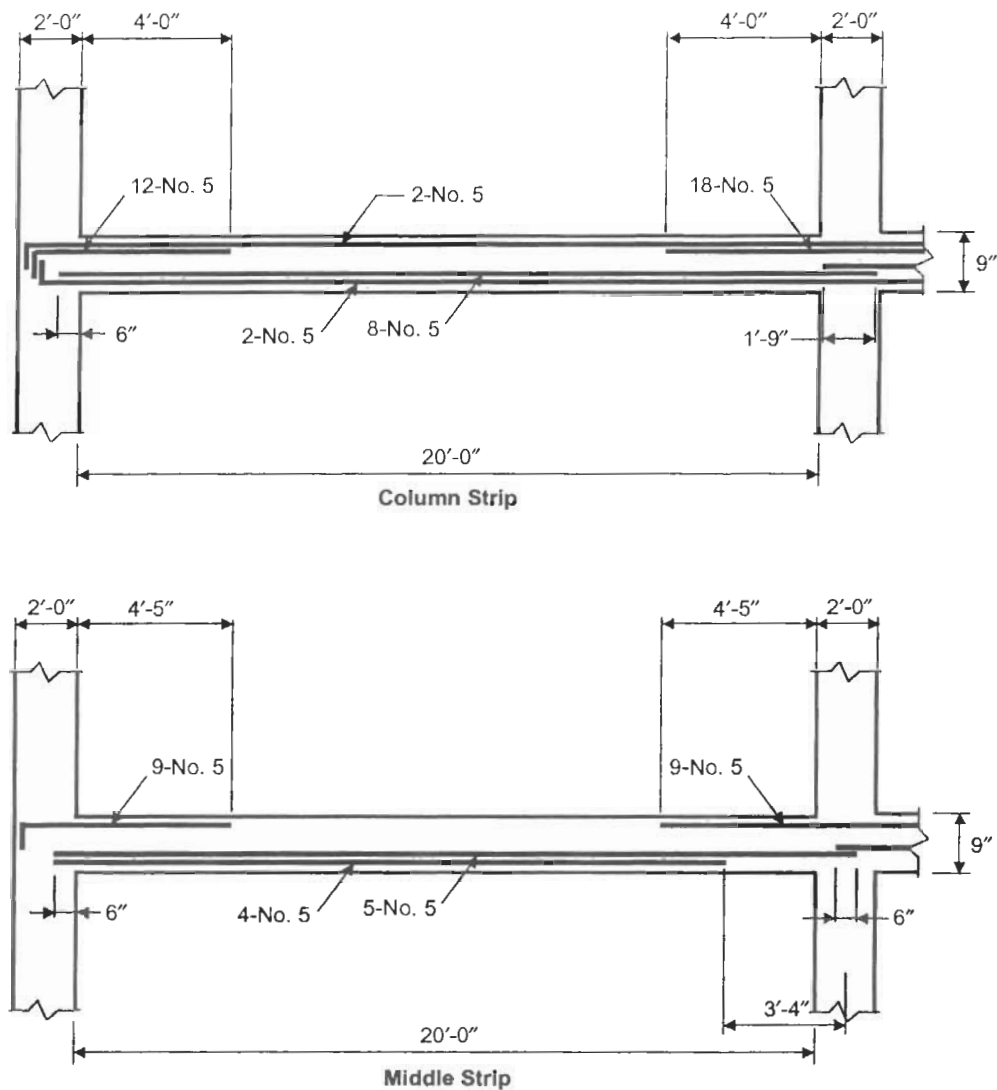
Reinforcement Details for Interior Design Strip, Floor Level 4 (SDC C)
